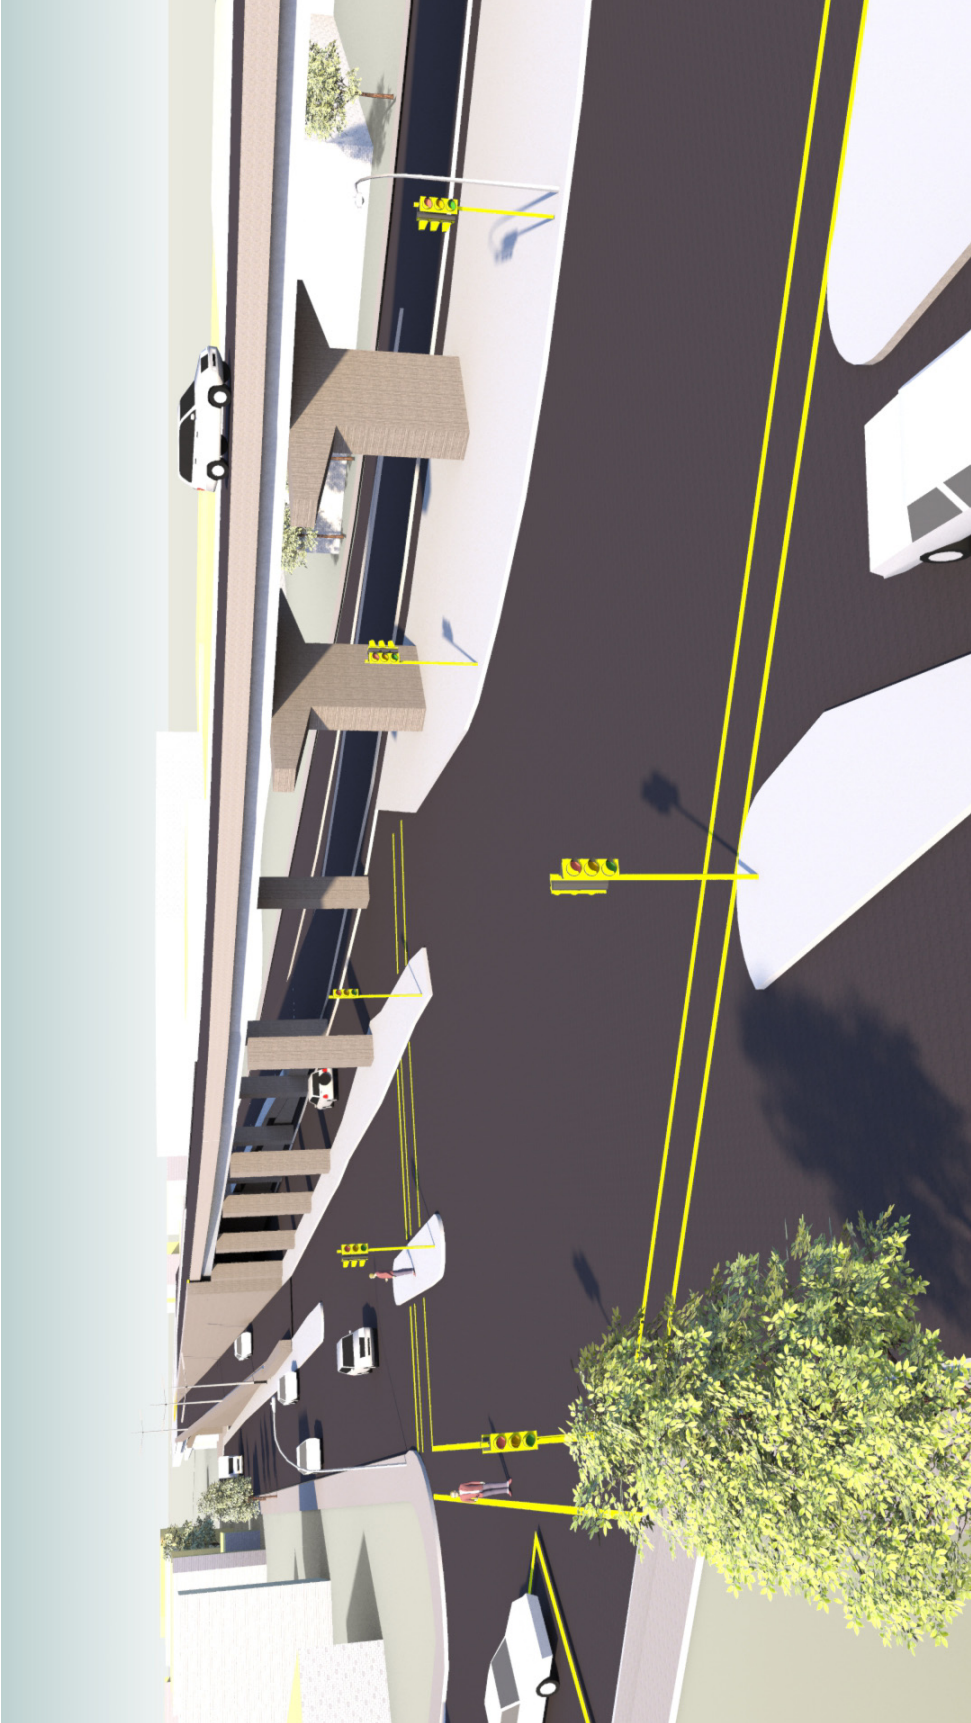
Visualization (looking north toward Washington St) of existing McGrath Highway southbound frontage road and down ramp at Somerville Ave.
